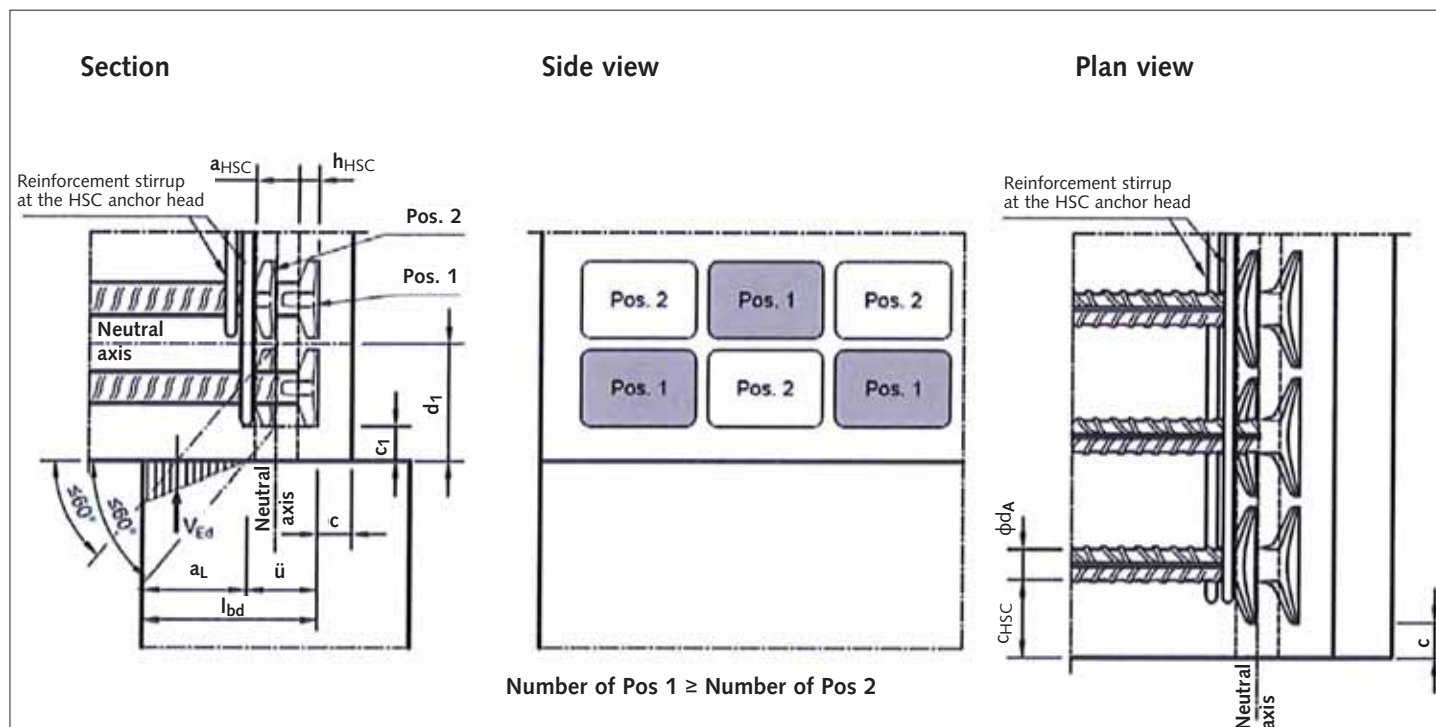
Arrangement of two-layer staggered HSC Anchors with triangular support stress; example
